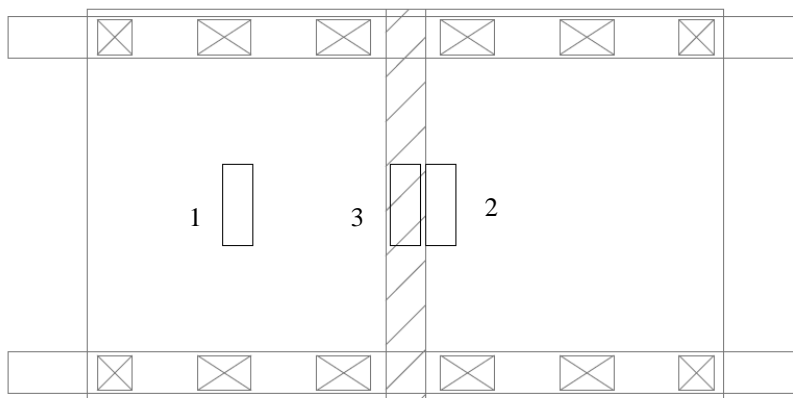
Load location layout. Fatigue loading proceeded from 1 to 2 to 3. Failure loading was applied at location 2 first and location 1 second.
